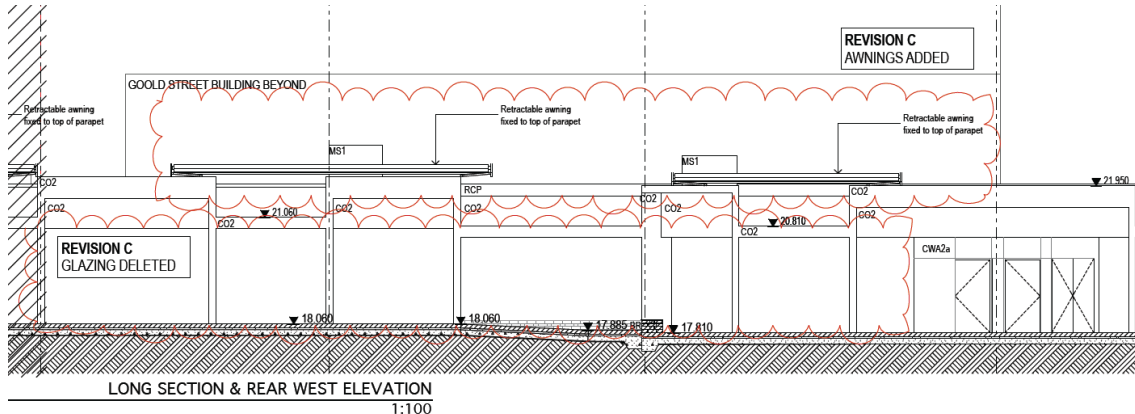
Approved and proposed façade treatment of the rear building of Block 6 + 7
